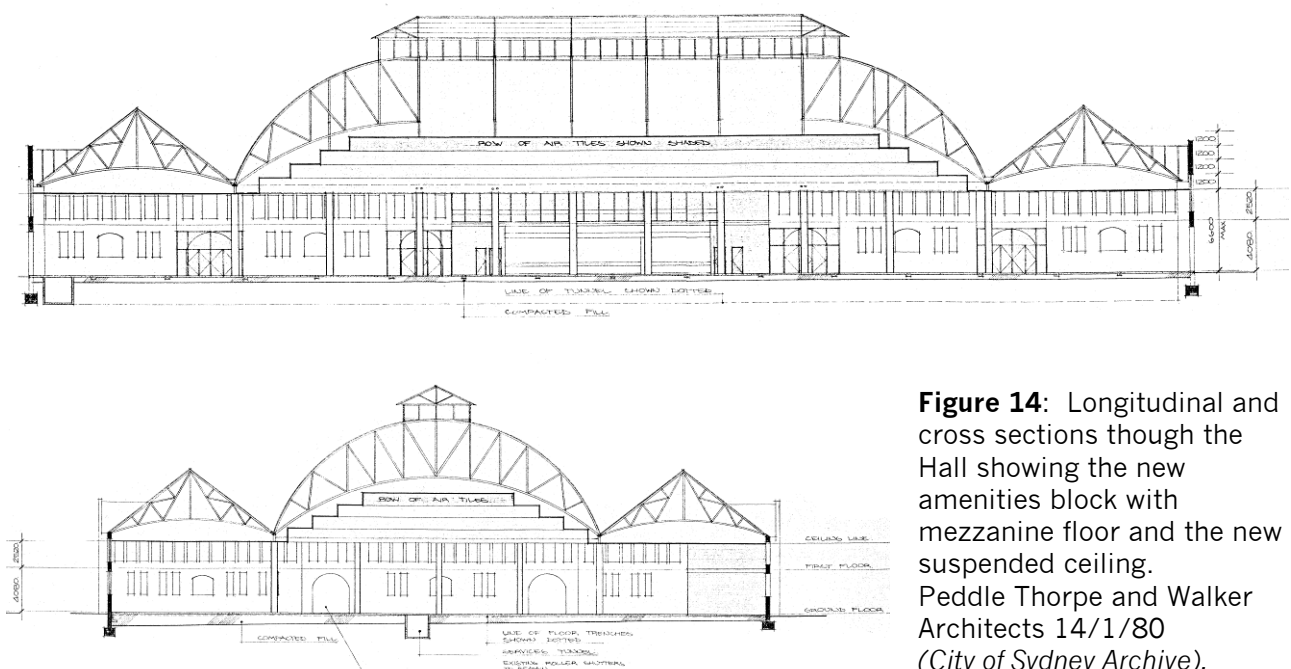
Longitudinal and cross sections through the Hall showing the new amenities block with mezzanine floor and the new suspended ceiling. Peddle Thorpe and Walker Architects 14/1/80 (City of Sydney Archive).
